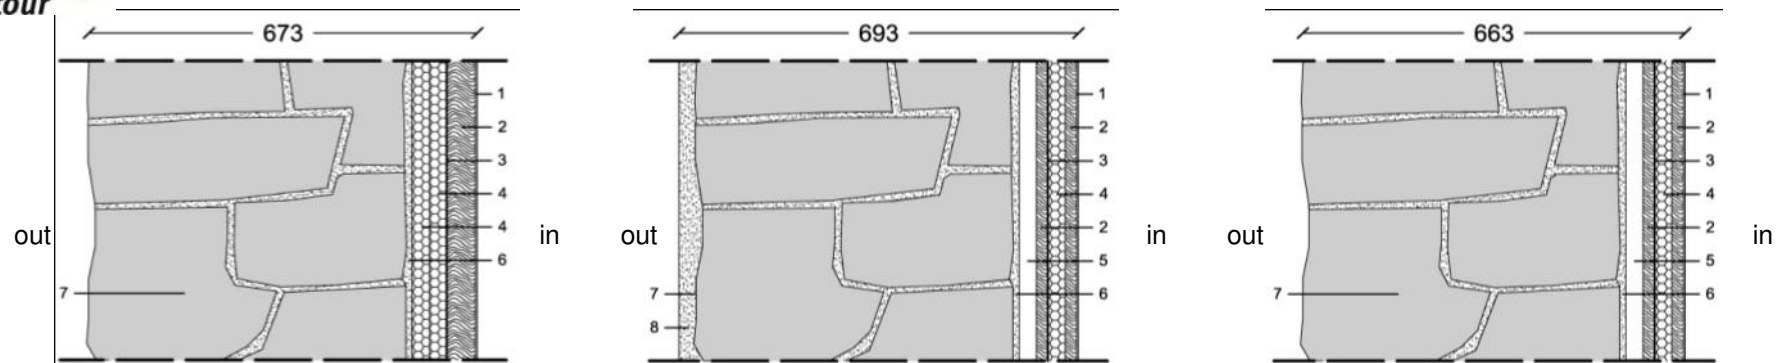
1:20 section of the north (*left*), south (*middle*), west (*right*) wall
